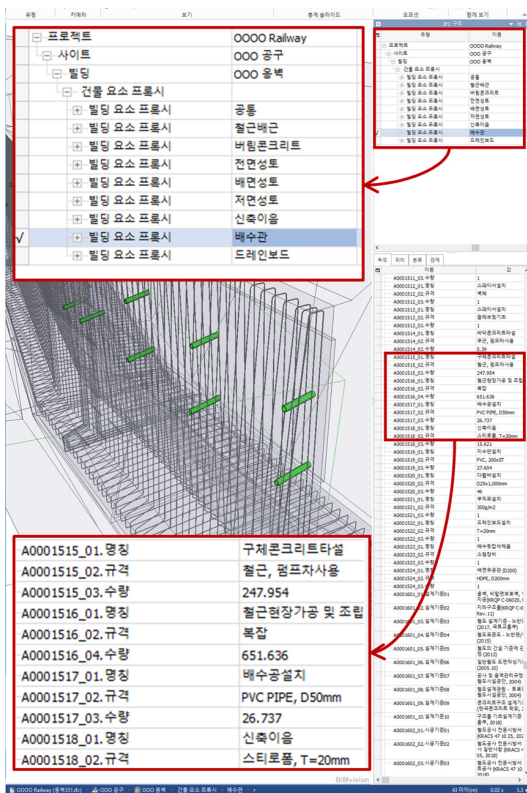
IFC Model of The Reinforced Concrete Retaining Wall Designed by The Parametric Model, LOG=3, LOI=2 (with BIM vision 2.26.3)
